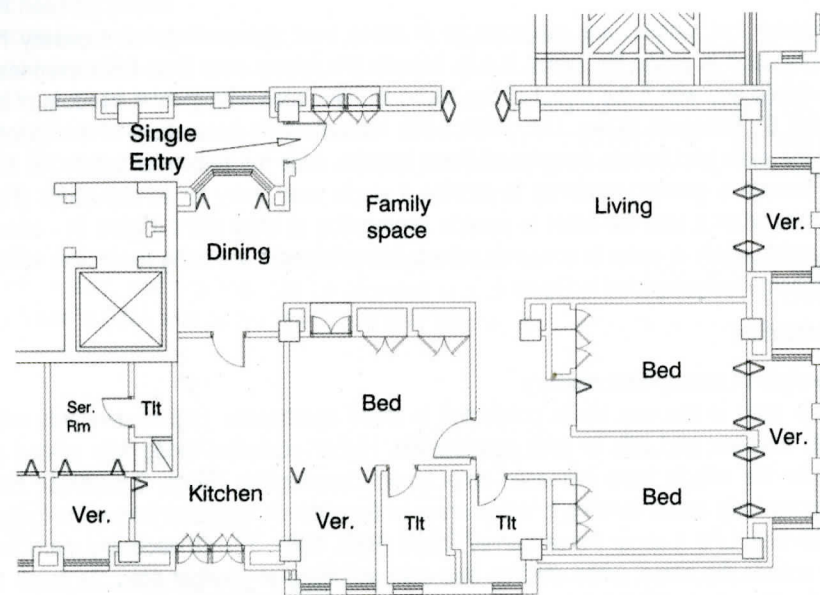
Plan with one entry, Dhanshiri, B. Haque
